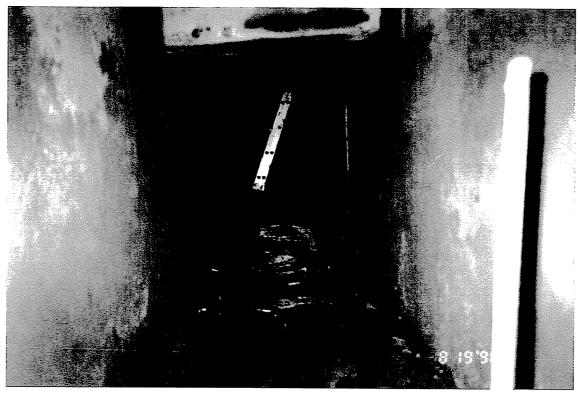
Groundwater infiltrating through several cracks located near the floor and wall interface of the Olson Pump Pit (Pit No. 11).
